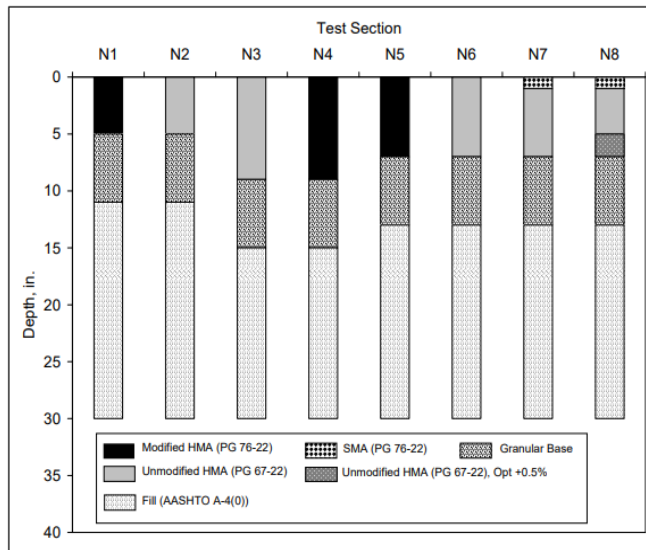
Final Design and Section Layout (after Timm et al, 2005).
